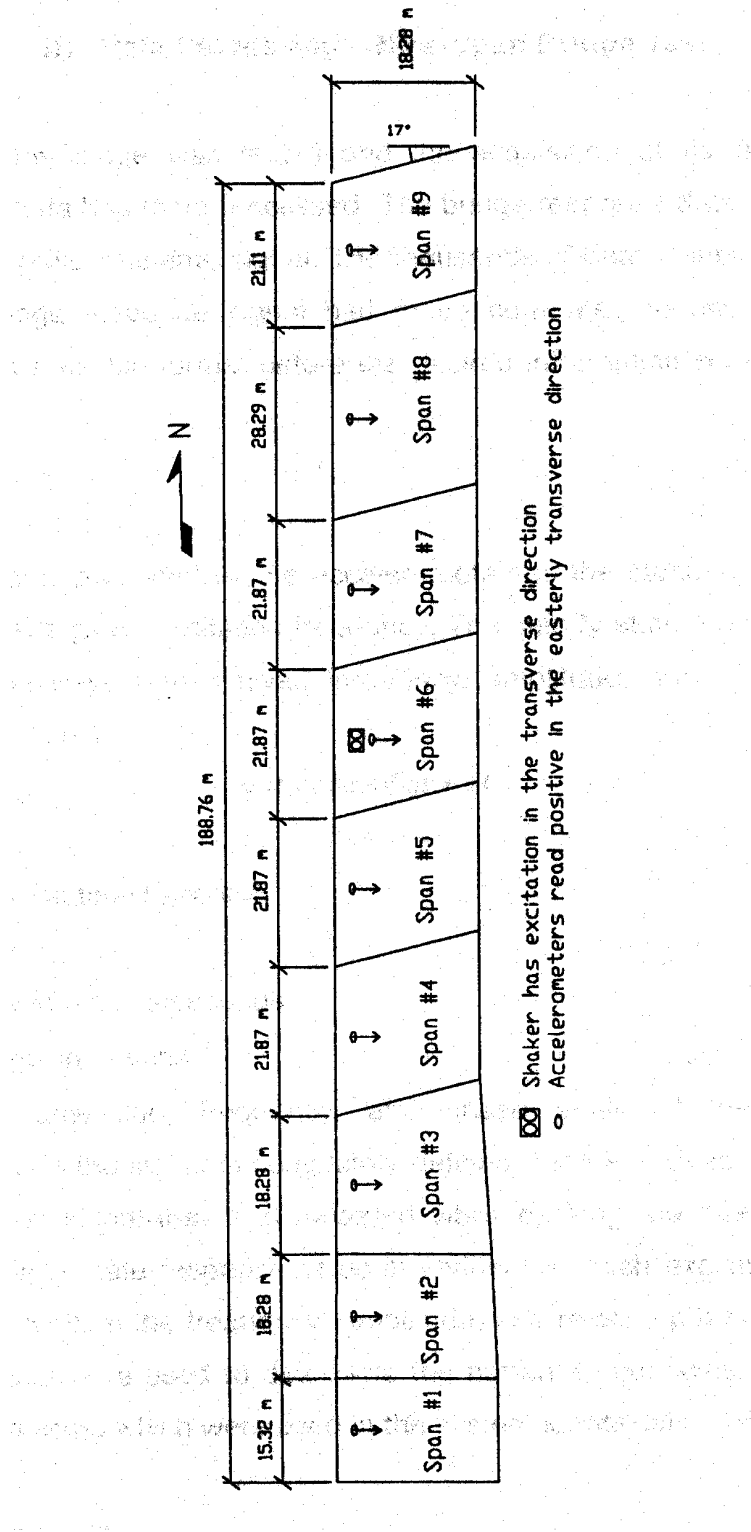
Plan of Nine-Span I-15 Overpass at South Temple
